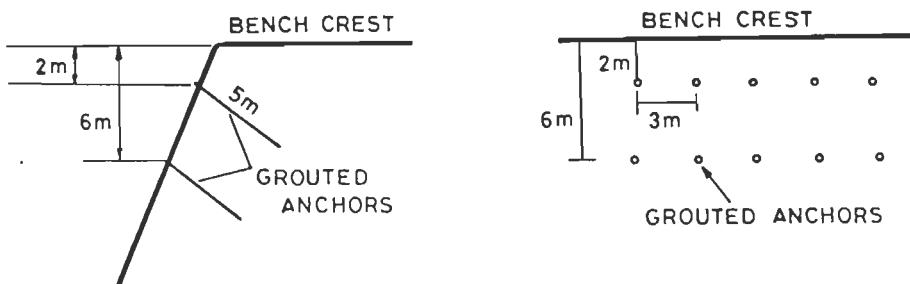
GROUTED ANCHORS TO CONTROL LOCAL FAILURES IN THE BENCHES
